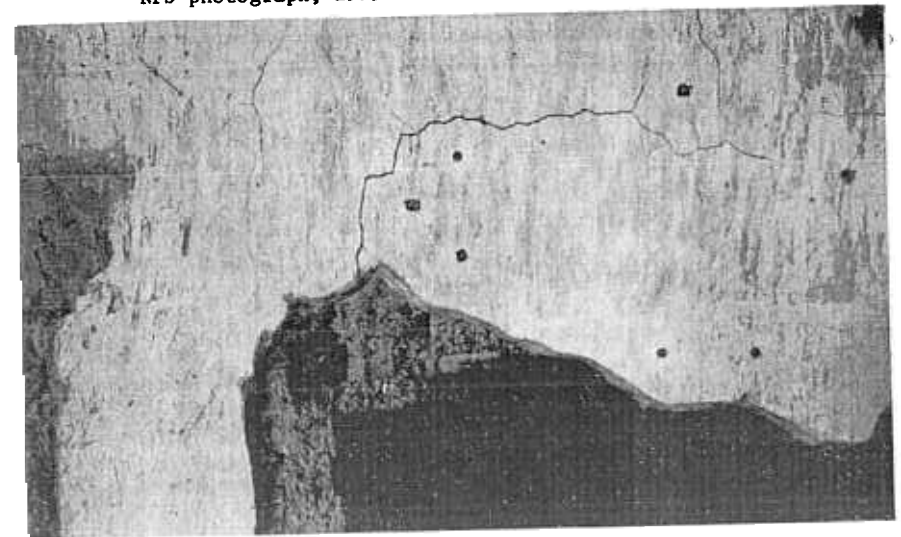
Plaster on interior surface west of the nave wall. Small dark spots are the locations of the steel pins used to secure the plaster to the mud brick walls.
